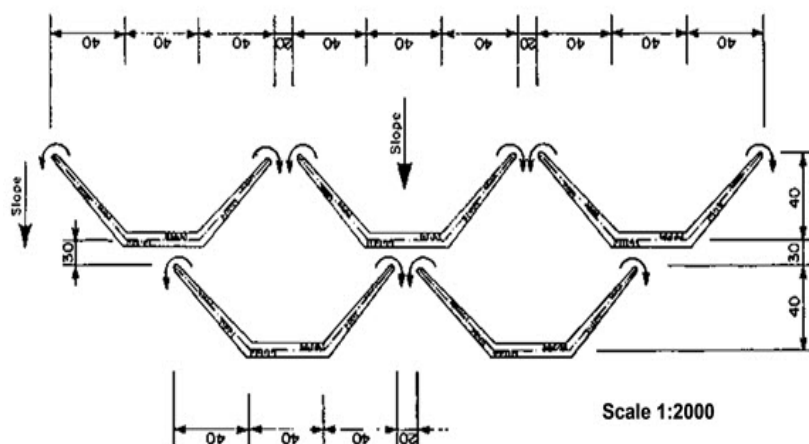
Layout of Trapezoidal Bund. (Source: Barron and Salas, 2009)
